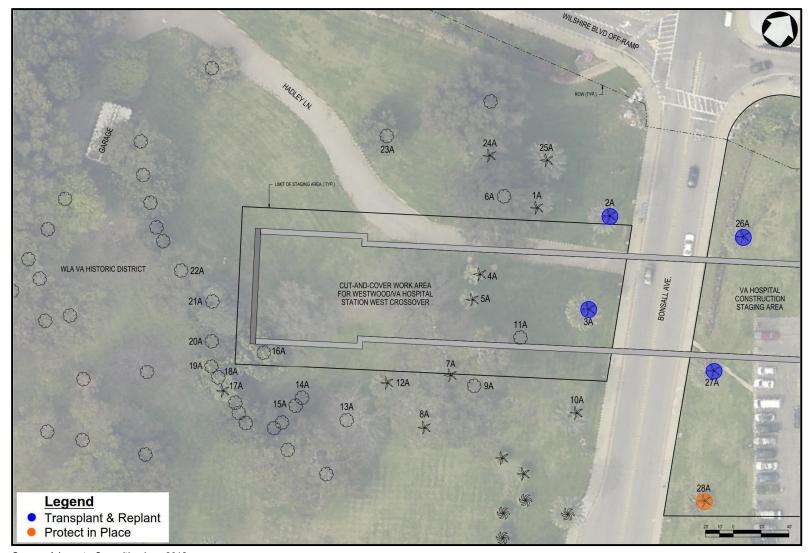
Tree Removal Plan near Bonsall Avenue
